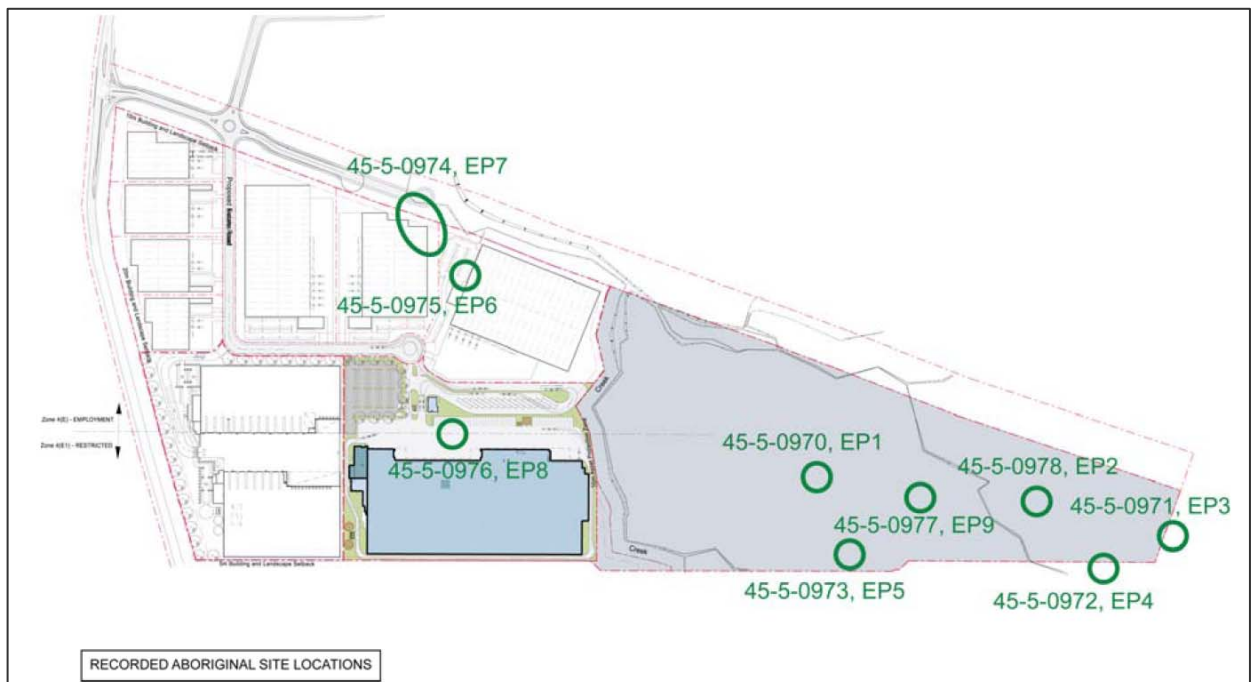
Recorded Aboriginal Sites (over estate layout plan as approved)
